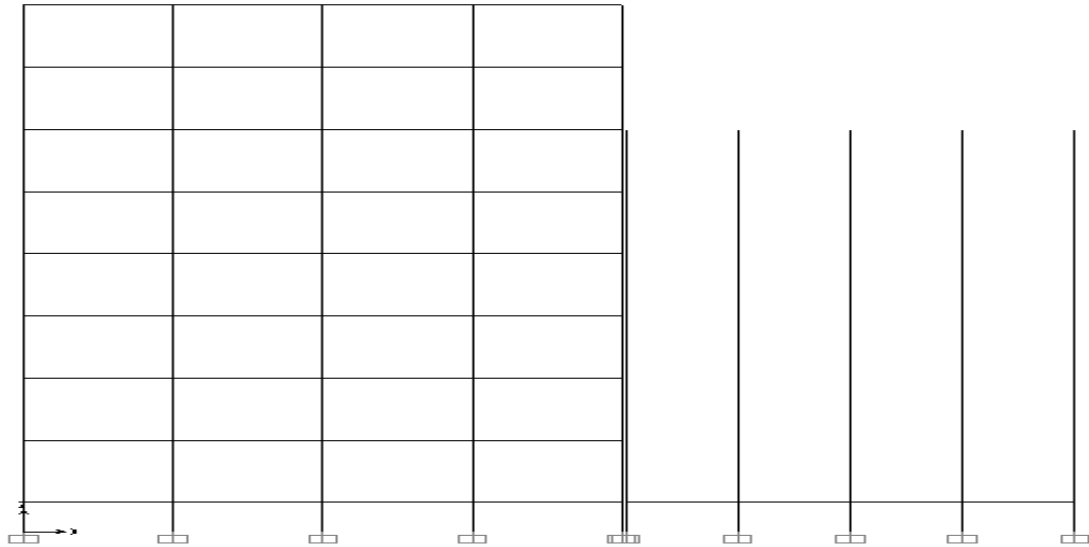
Elevation view of beam column system adjacent to Flat slab system
